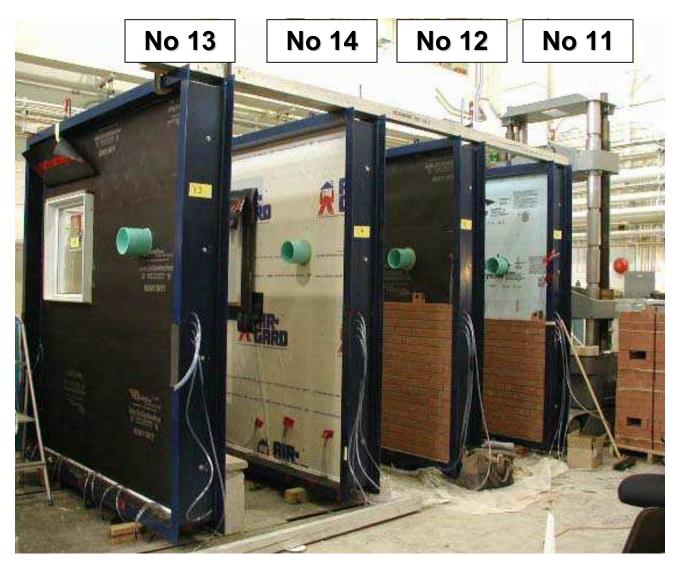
The four specimens were installed in Building M-20 for the brick laying stage.
